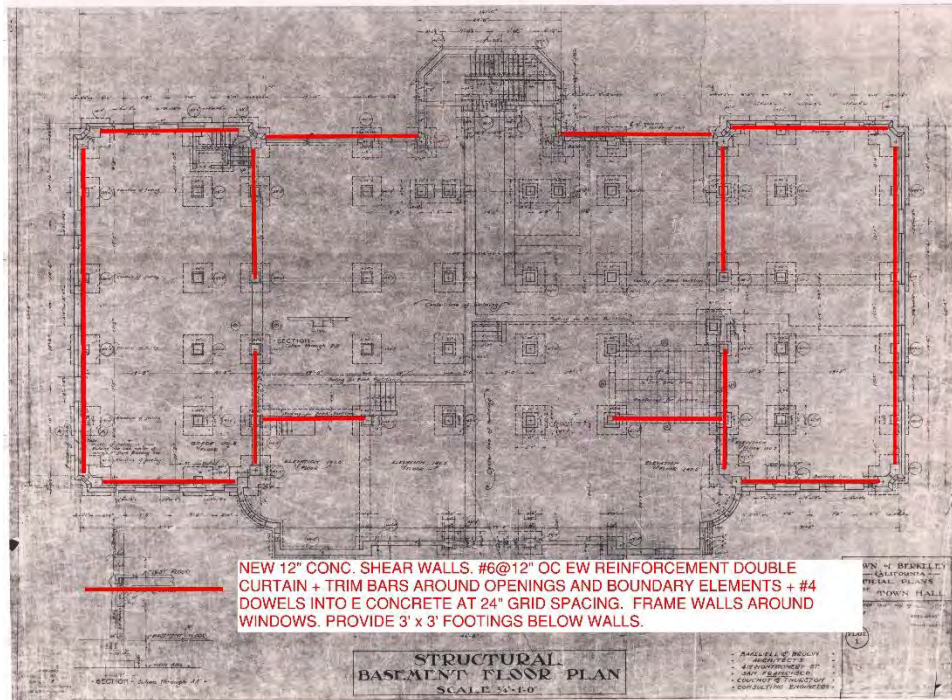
Seismic Retrofit Scheme (Concrete Shear Walls) at Basement
